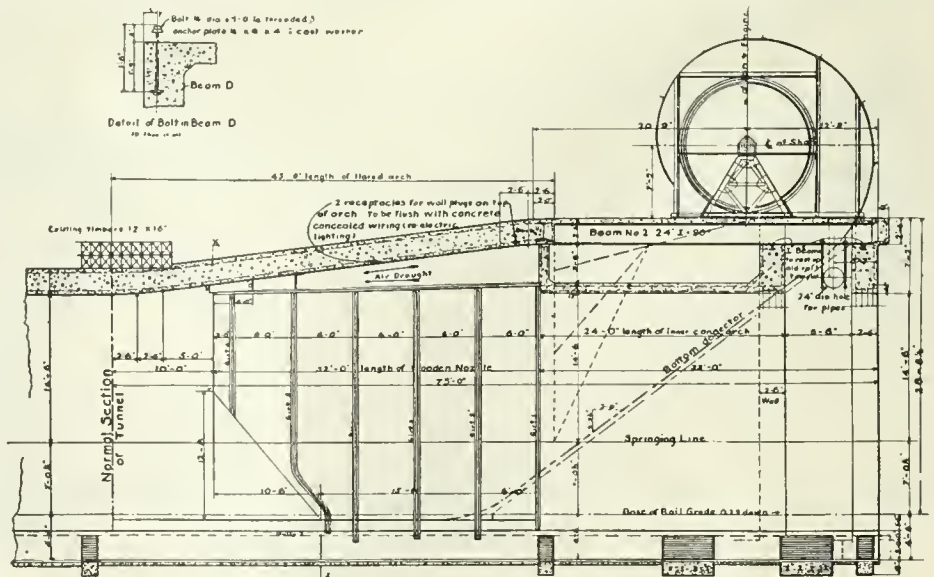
Connaught Tunnel Ventilation, Longitudinal Section.
